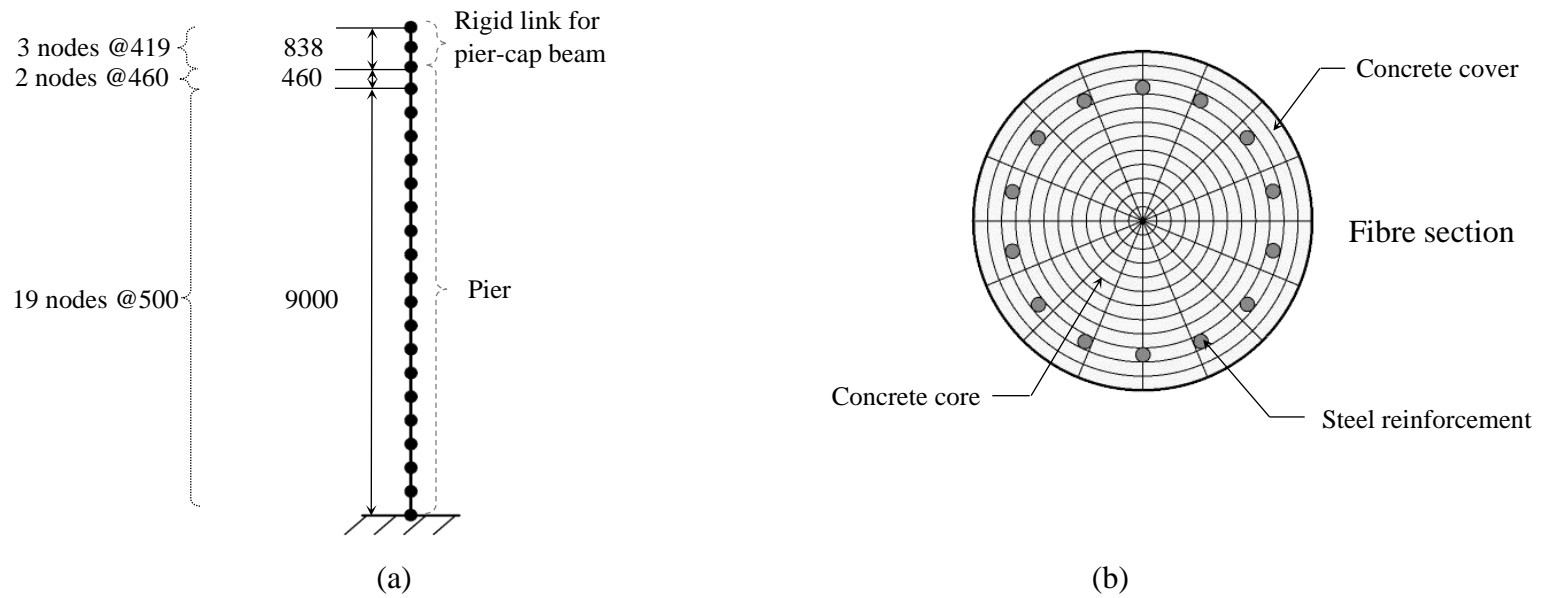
Numerical model of case study bridge: (a) pier model details; and (b) fibre discretization of circular cross-section of pier. All dimensions are in mm.
